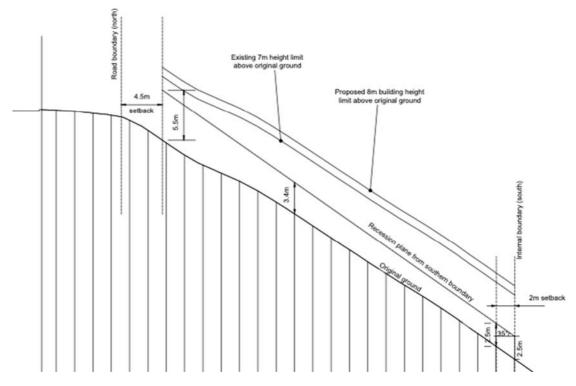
LDSRZ Recession Planes – Sloping Site (South Facing)
